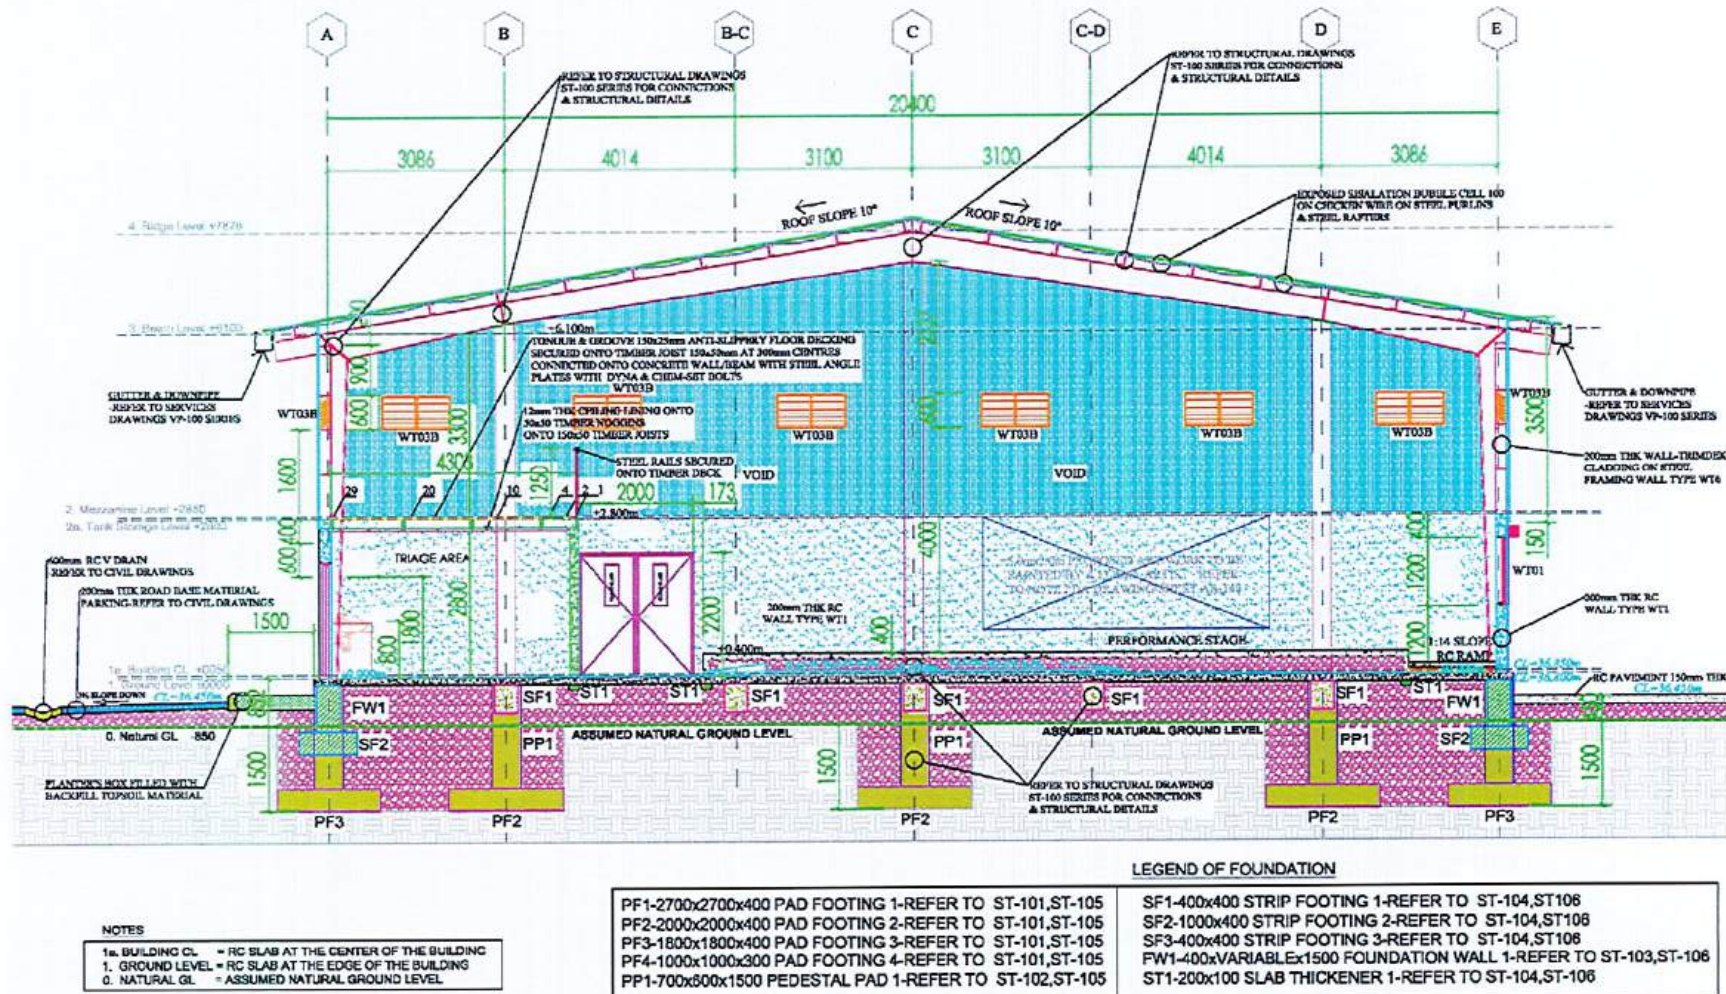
Shelter typical cross-section (view of the washroom at ground floor level and the offices and tanks at mezzanine level)
